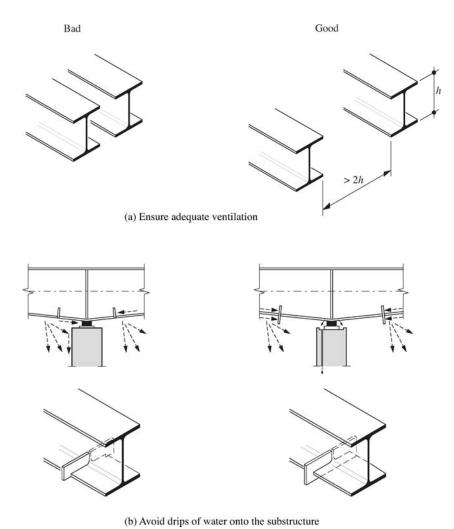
Examples of construction details appropriate for use with weathering steels.
